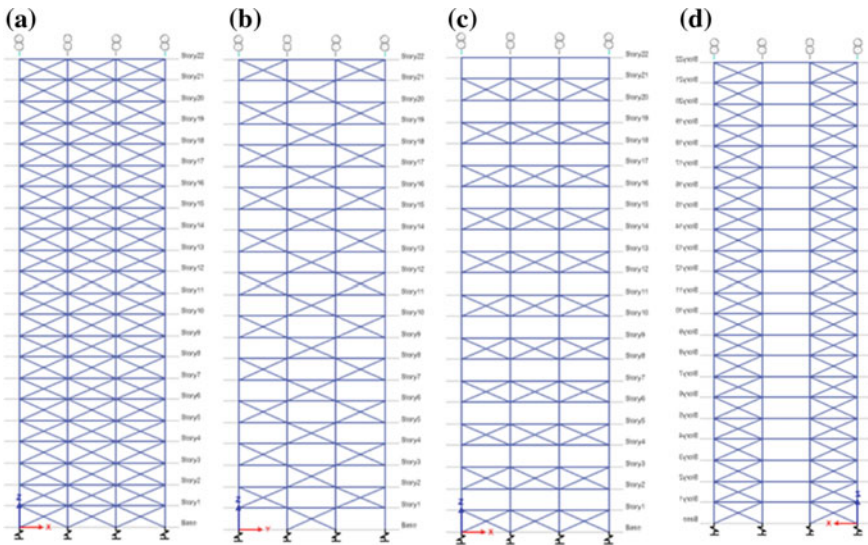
Elevation of 22 storey diagrid buildings with X bracing pattern arrangement (a whole, b alternate, c horizontal, d vertical)
